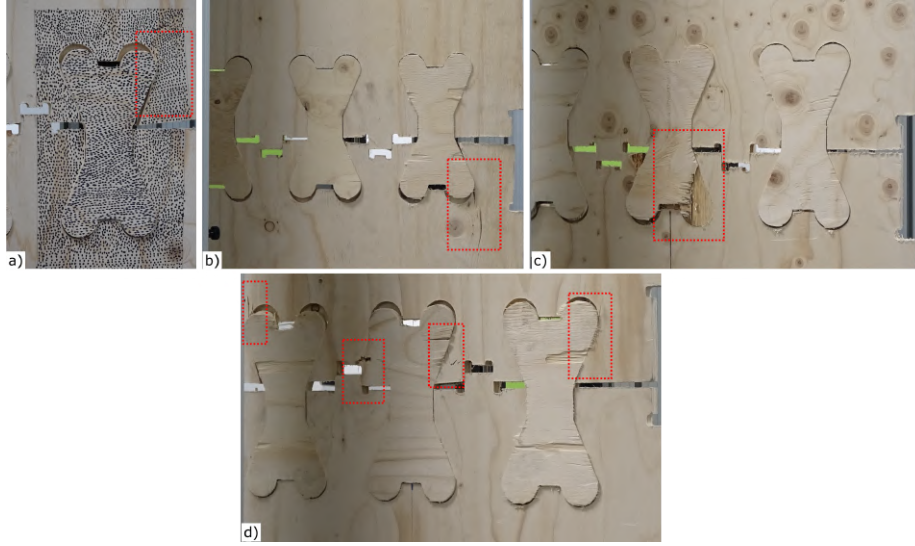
Observed failure modes in a) specimen 1, b) specimen 2, c) specimen 3 and d) specimen 4.
